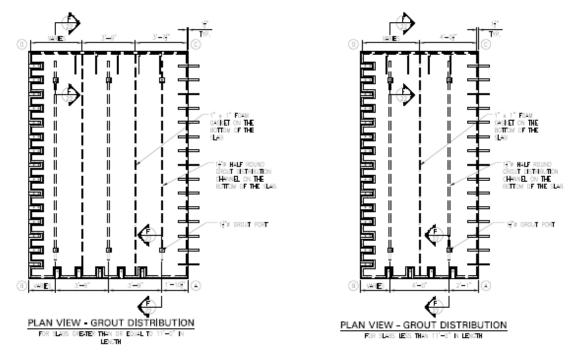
Diagram. Typical panel shop drawings (load transfer and undersealing details).
